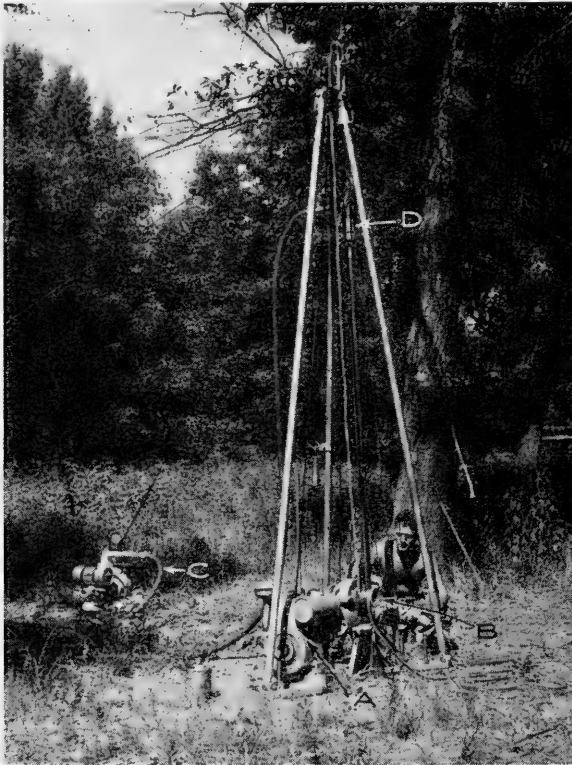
Portable drill for shallow drilling. A, engine driving rotary table; B, cathead; C, mud hose; D, swivel head. (Courtesy of Engineering Laboratories, Inc.)
